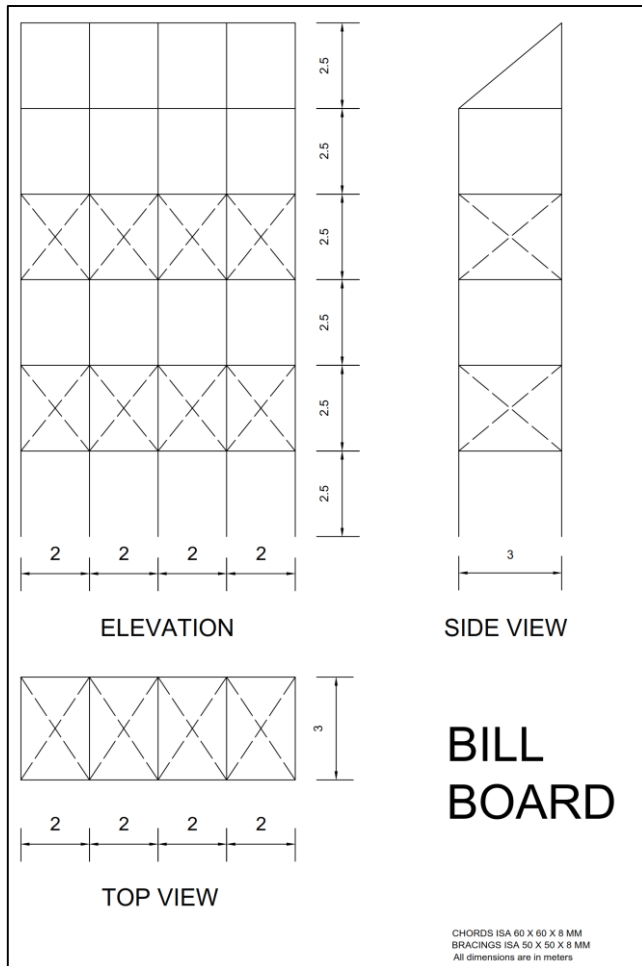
Plan and elevation details of the billboard installed on the considered structure
